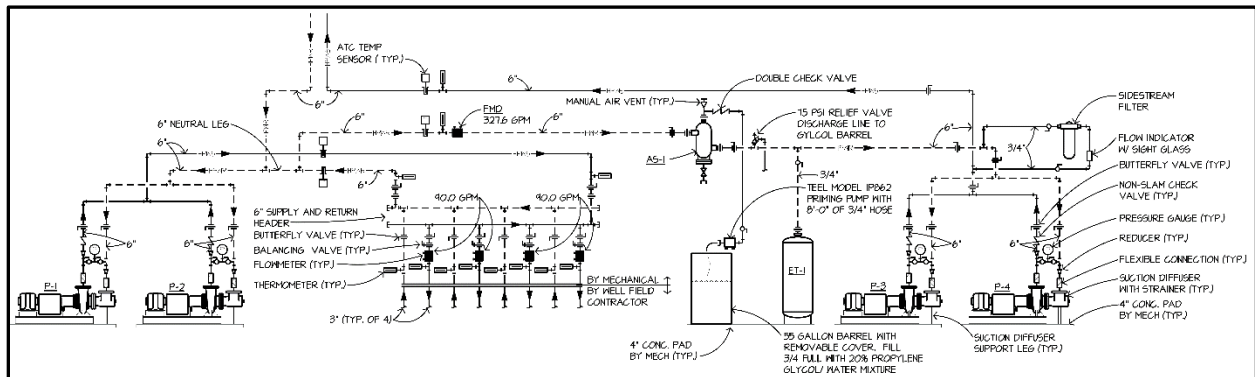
WSC Frontier Residence Hall heat pump piping detail
